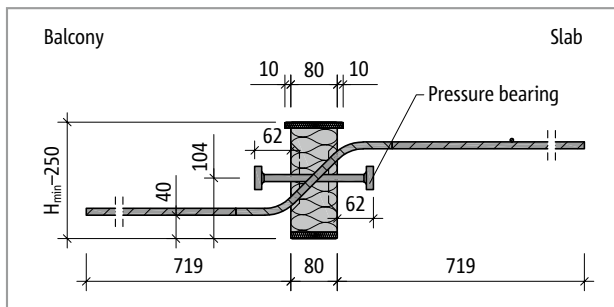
Schöck Isokorb® T type Q-P-V7: Product section
